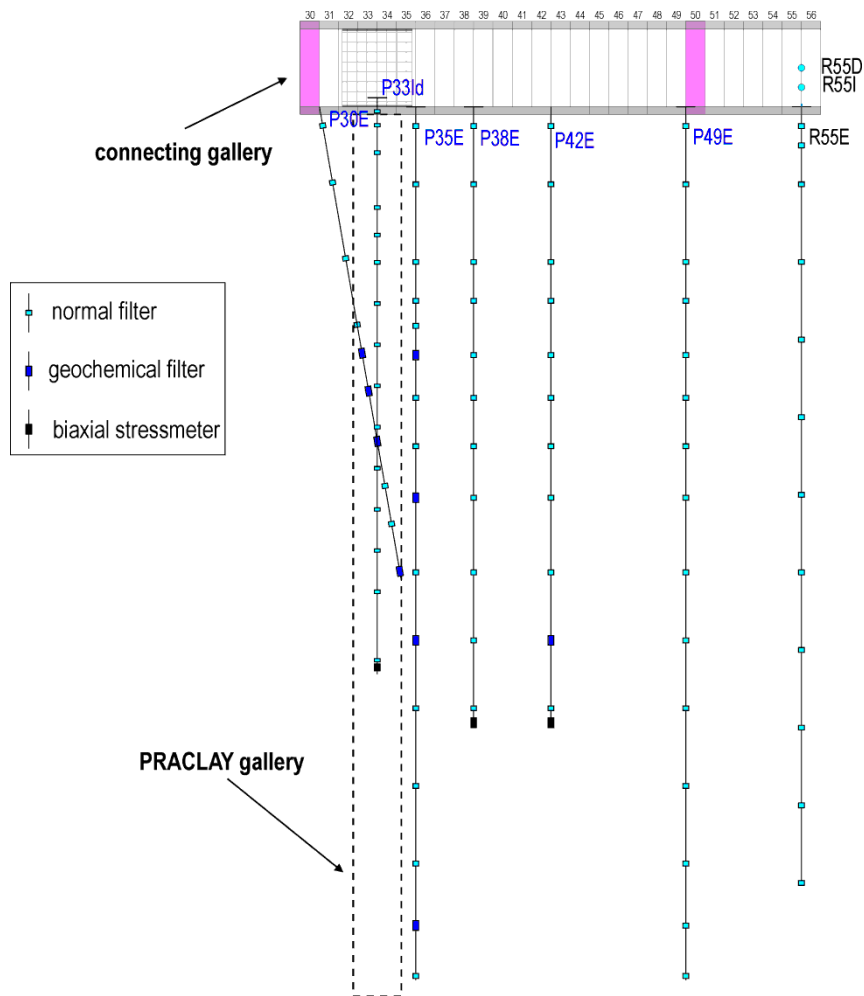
Layout of the instrumented boreholes installed around the PRACLAY gallery. The normal filters are used to measure pore water pressure.
